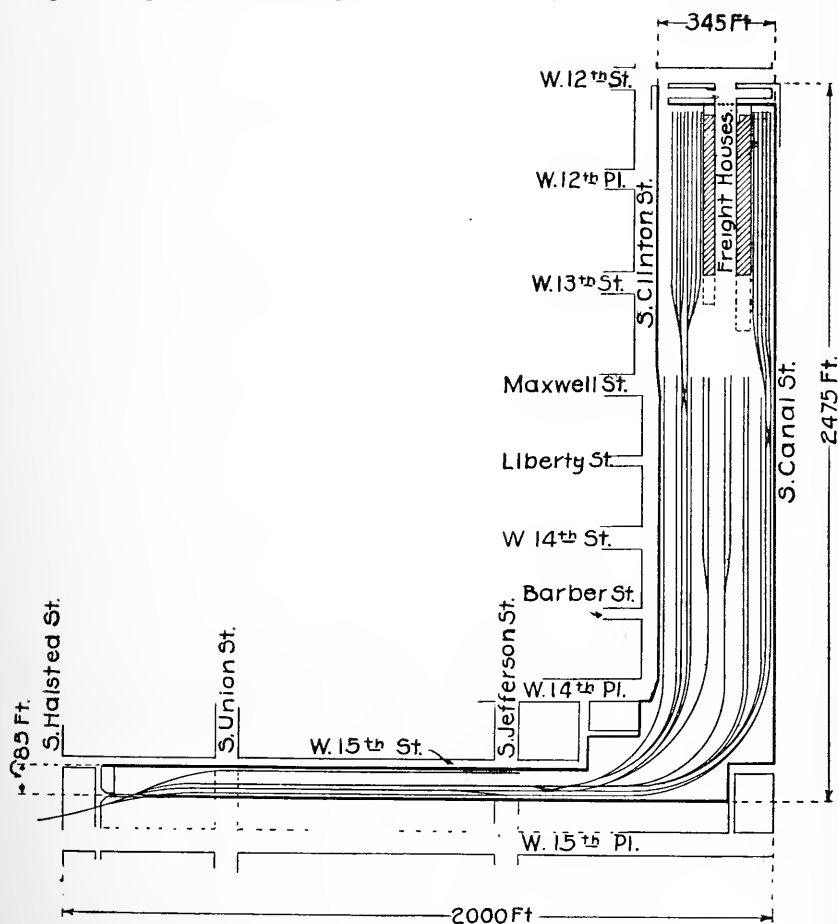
GENERAL PLAN OF SOO TERMINAL STRUCTURE.
